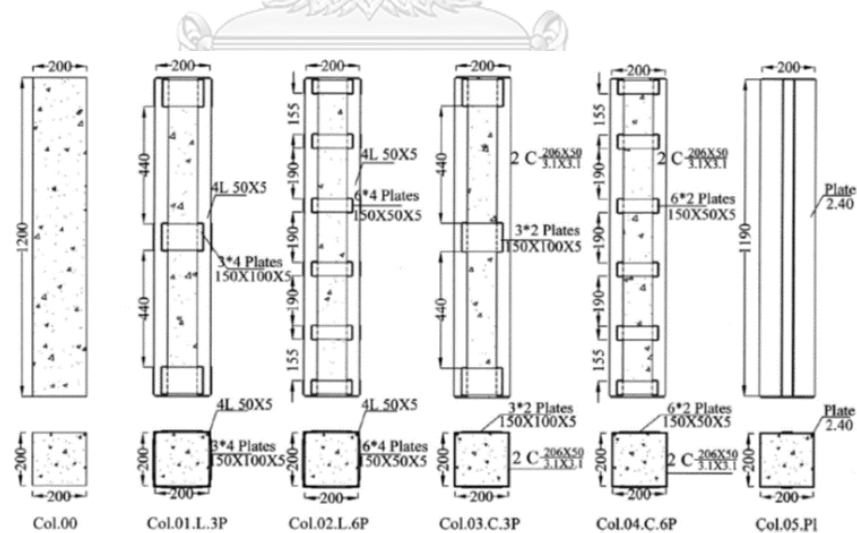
Specimen dimension and steel jacket configuration [33]
